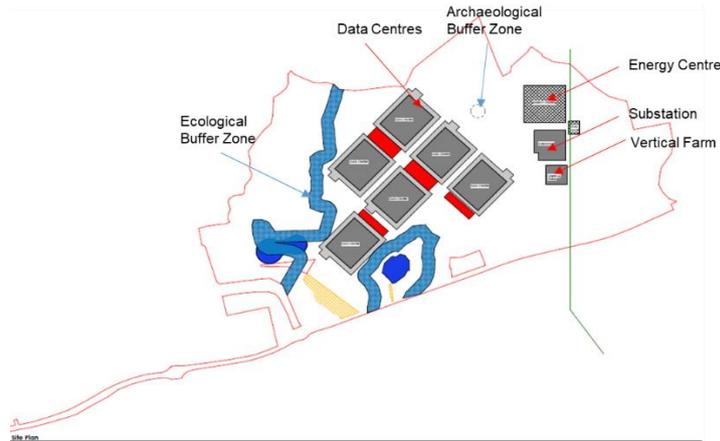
Proposed Layout (Layout 1 –“the proposed layout”)
